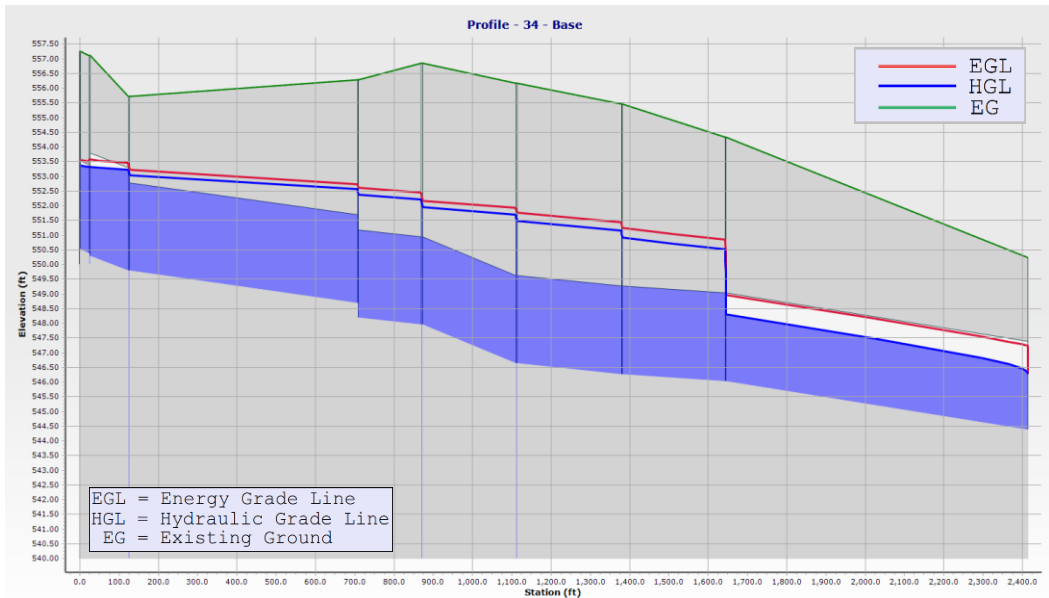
Proposed Baxter St/Guadalupe St Pipe Profile (25-YR Storm Event)
